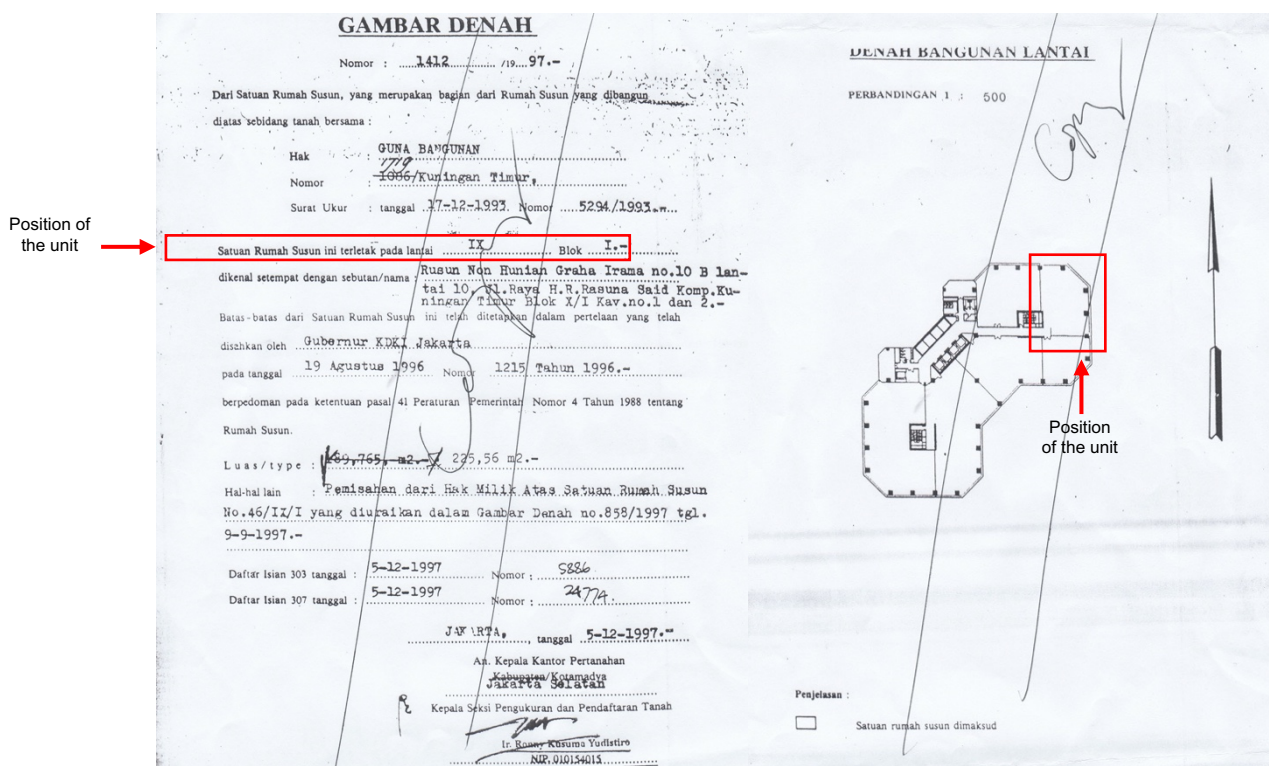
Map of the apartment floor (*Gambar Denah*): Scale 1:500
